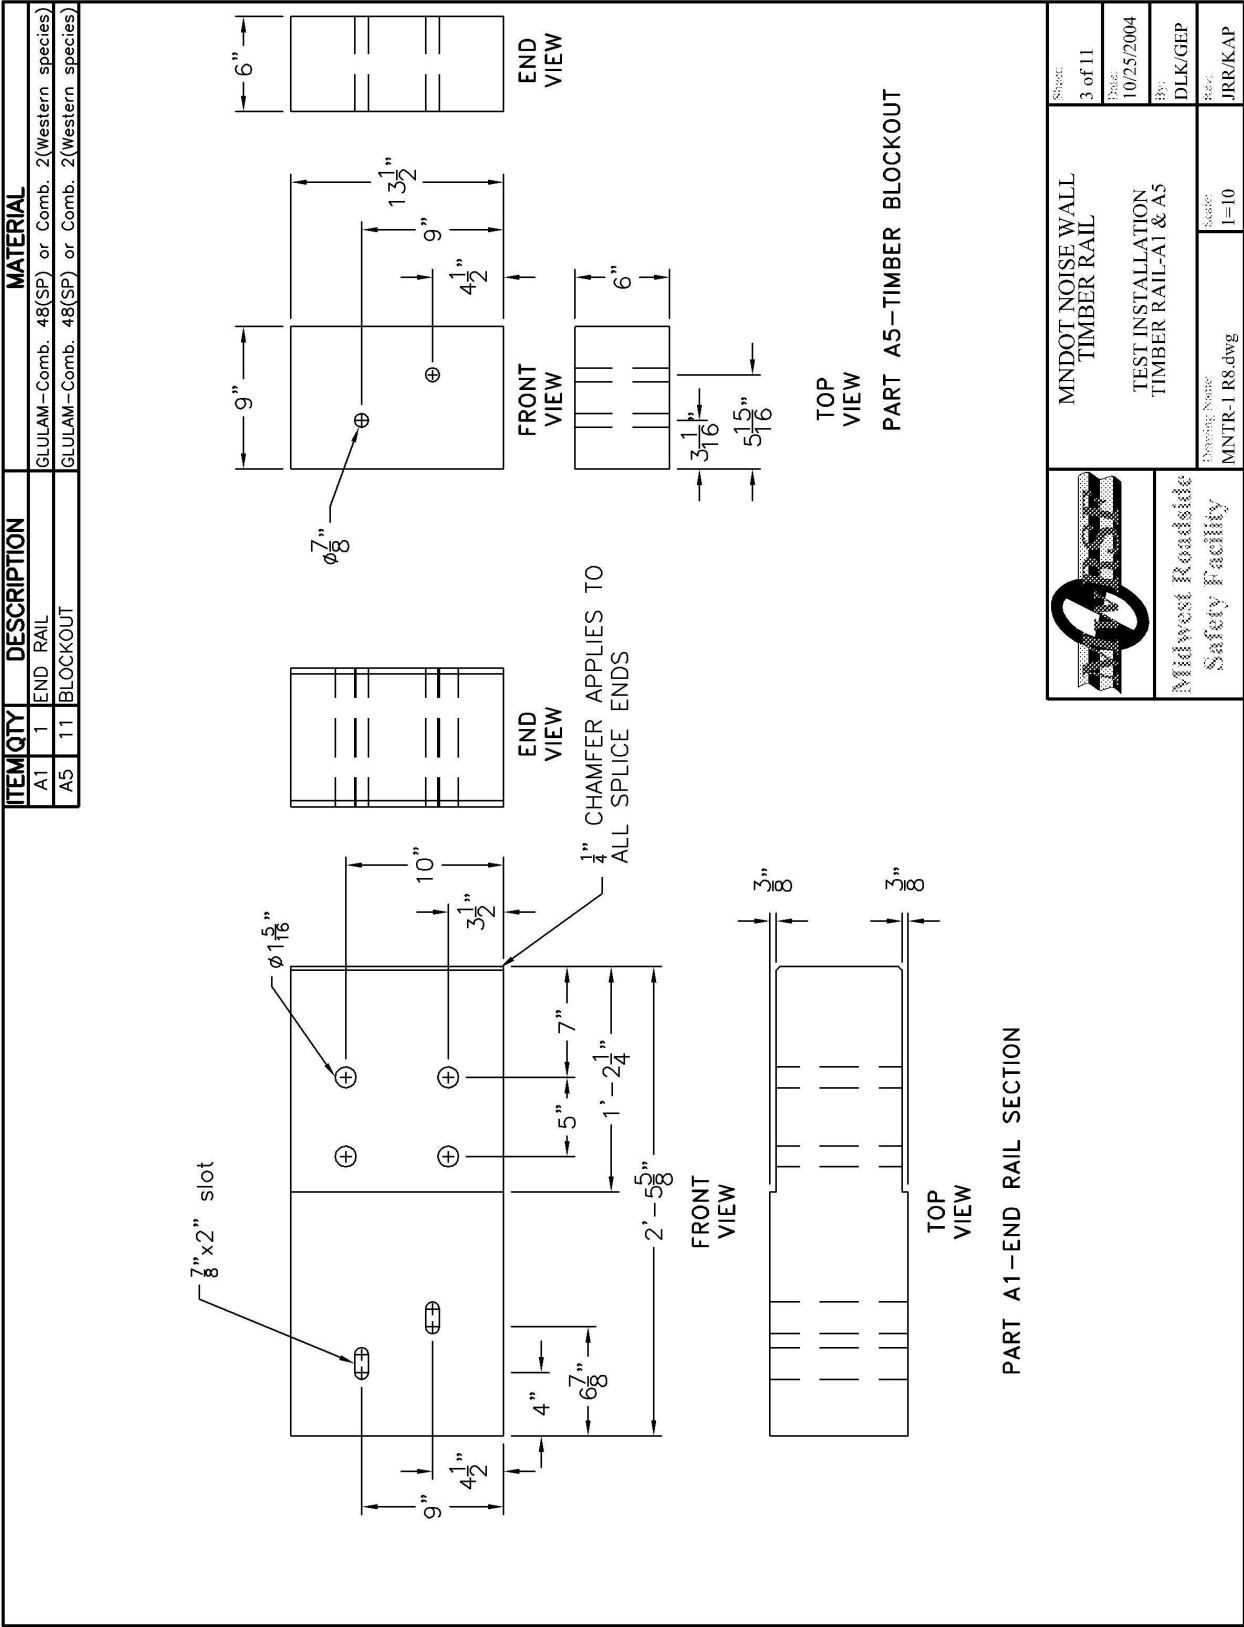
Mn/DOT's Timber Rub Rail Design Rail and Timber Blockout Details (English)
